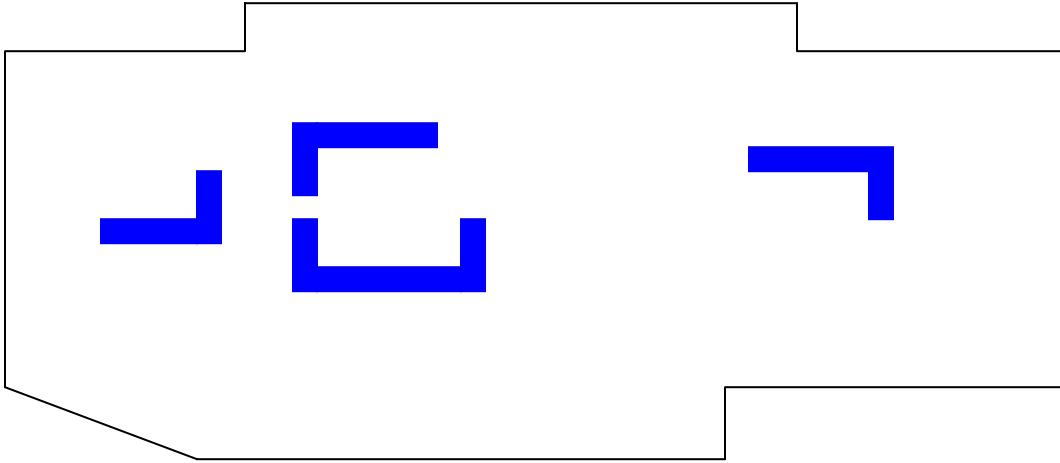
Shear wall layout for the 39<sup>th</sup> floor
